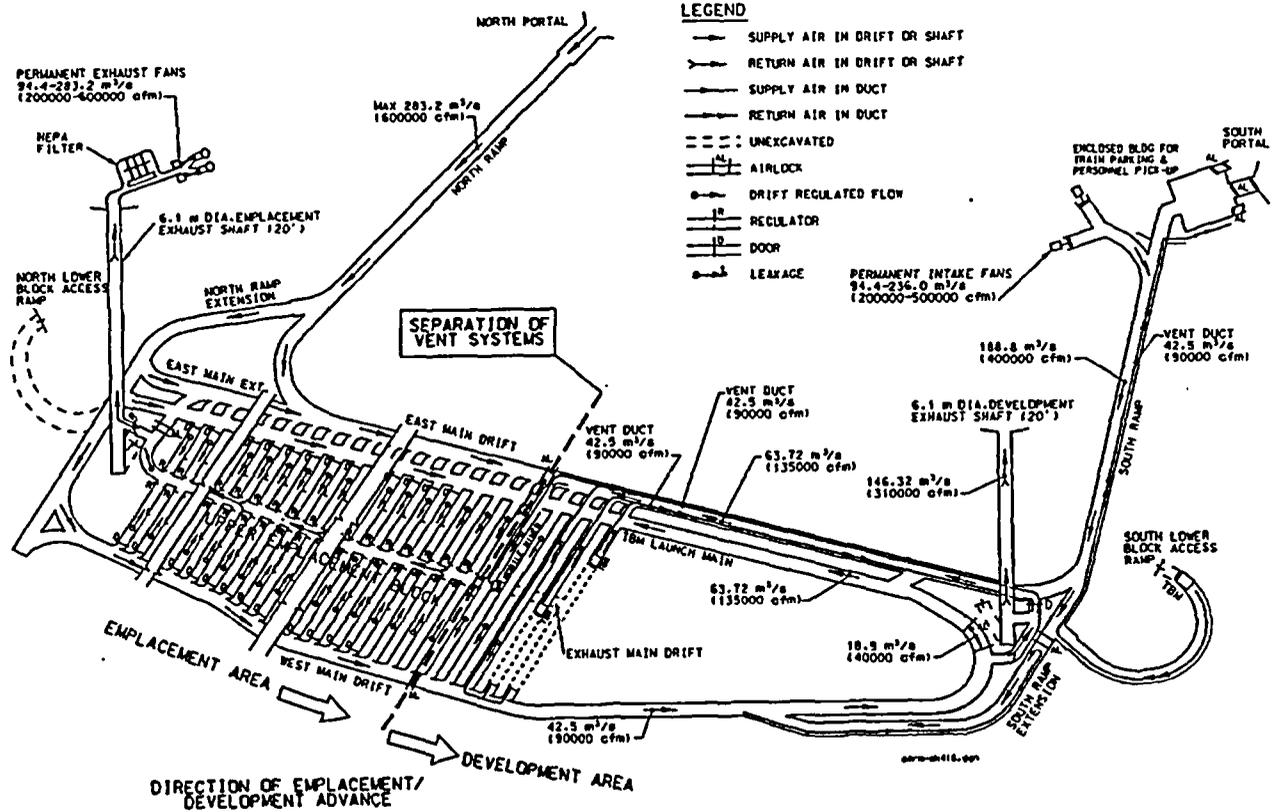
Separate Ventilation Systems for Development and Emplacement
